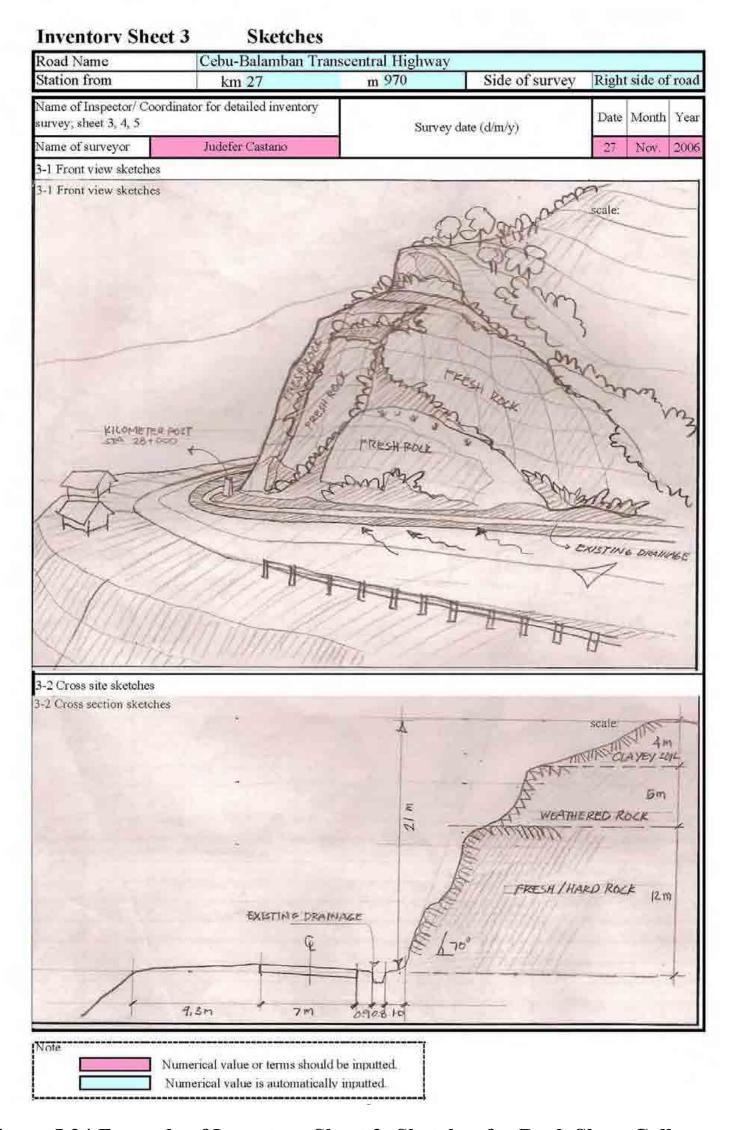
Example of Inventory Sheet 3: Sketches for Rock Slope Collapse
